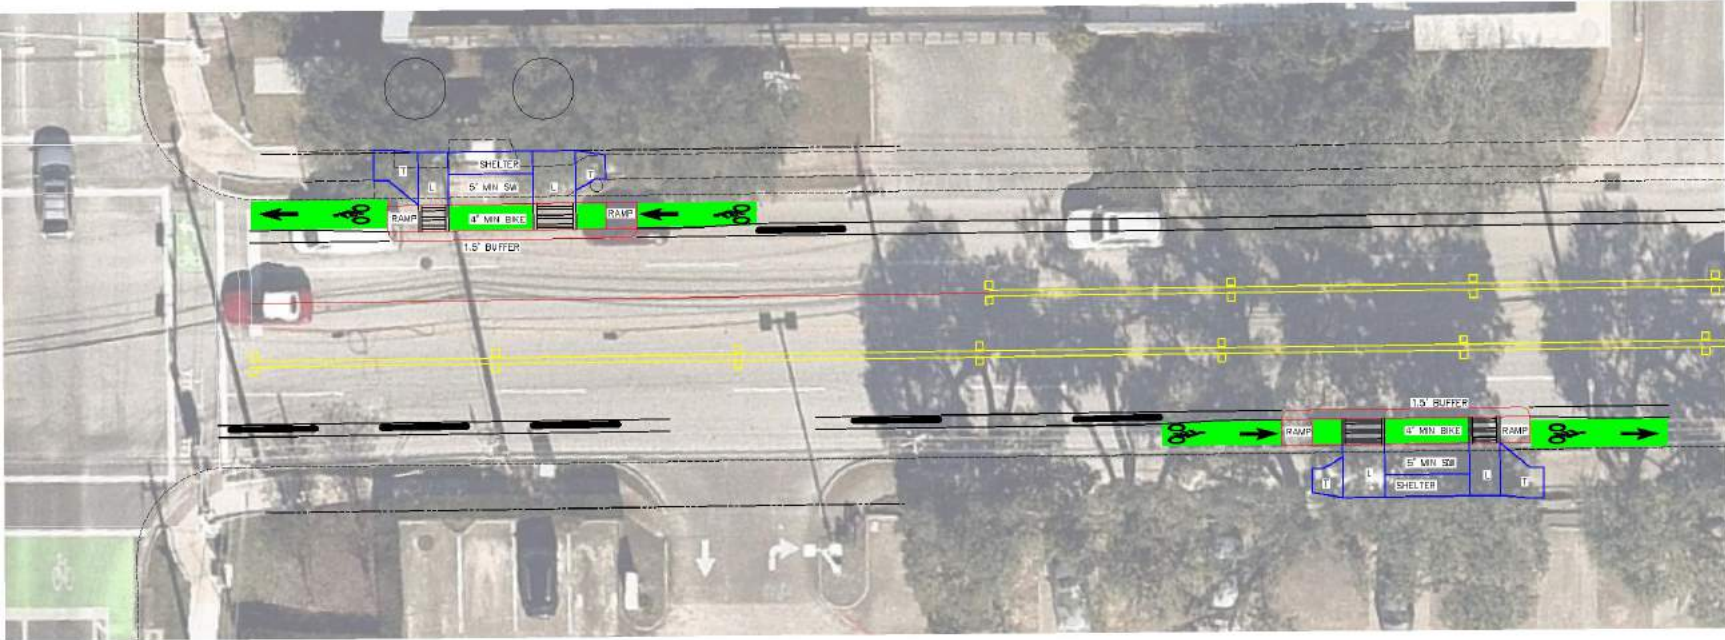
Proposed W Dallas Street & Waugh Drive Intersection Schematic— Westbound Approach
